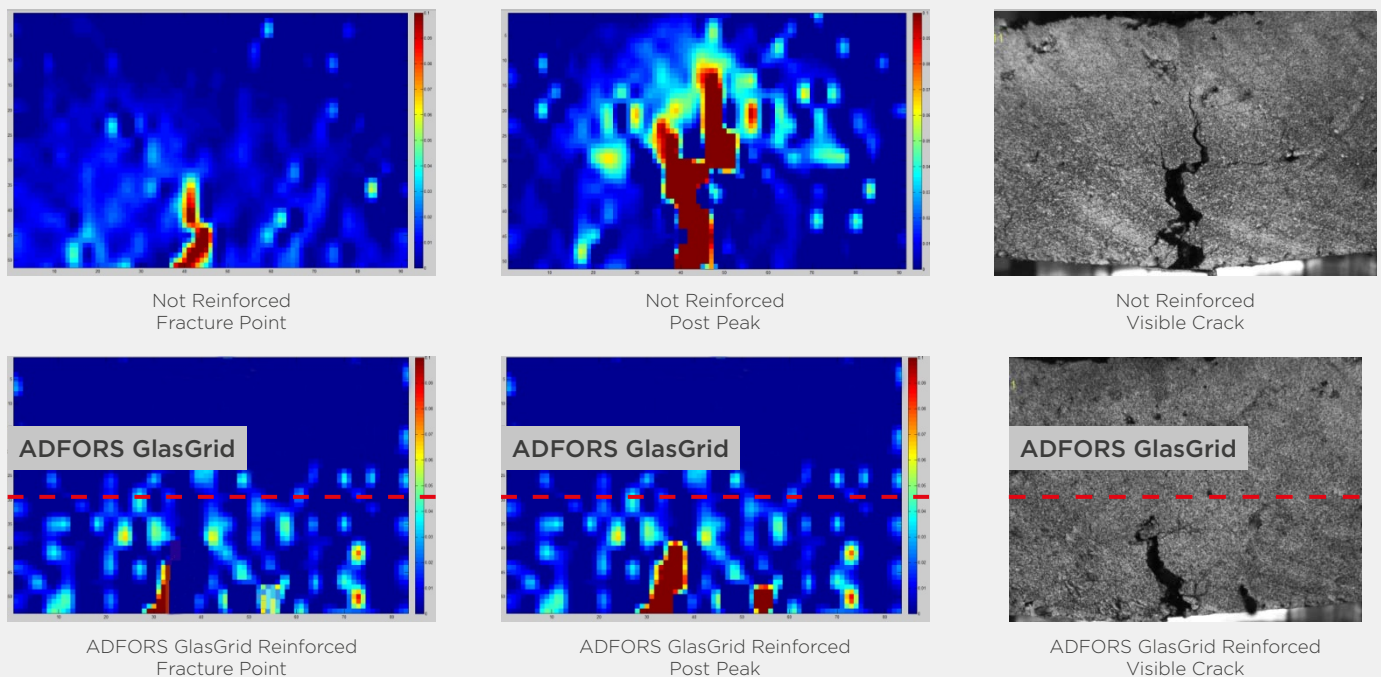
Crack propagation via Asphalt beam cross section (DIC method)
